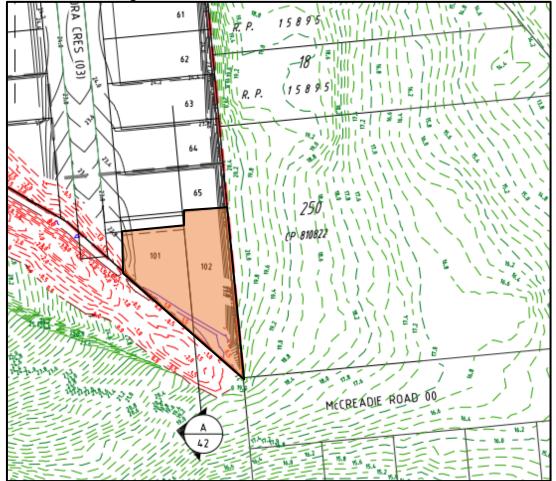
Earthworks Cut to Fill Plan Sheet 02 of 02
